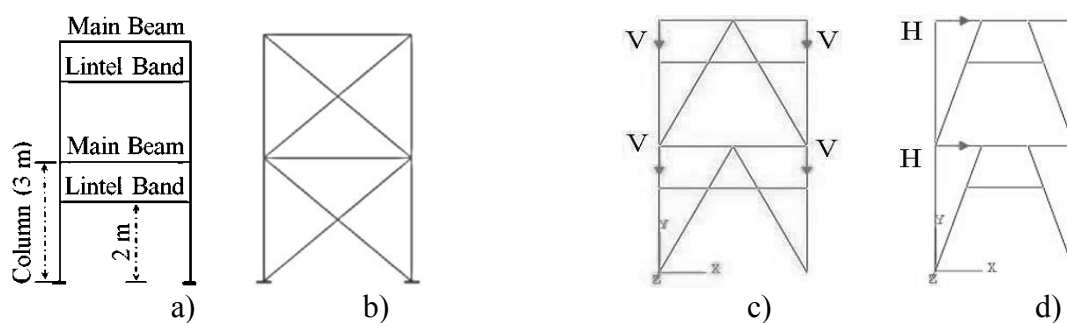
a) One bay two storied frame with lintel bands, b) X bracing, c) Vertical loading (V) in chevron braced frame with lintel bands and d) Lateral loading (H) in eccentric chevron braced frame with lintel
